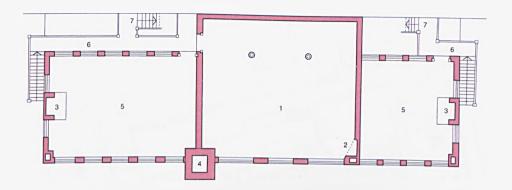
First floor plan of Gaunt's wheel, scale 1:200 (author).
